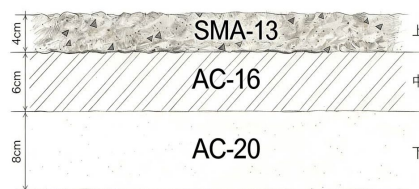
Schematic diagram of asphalt pavement surface layer structure
